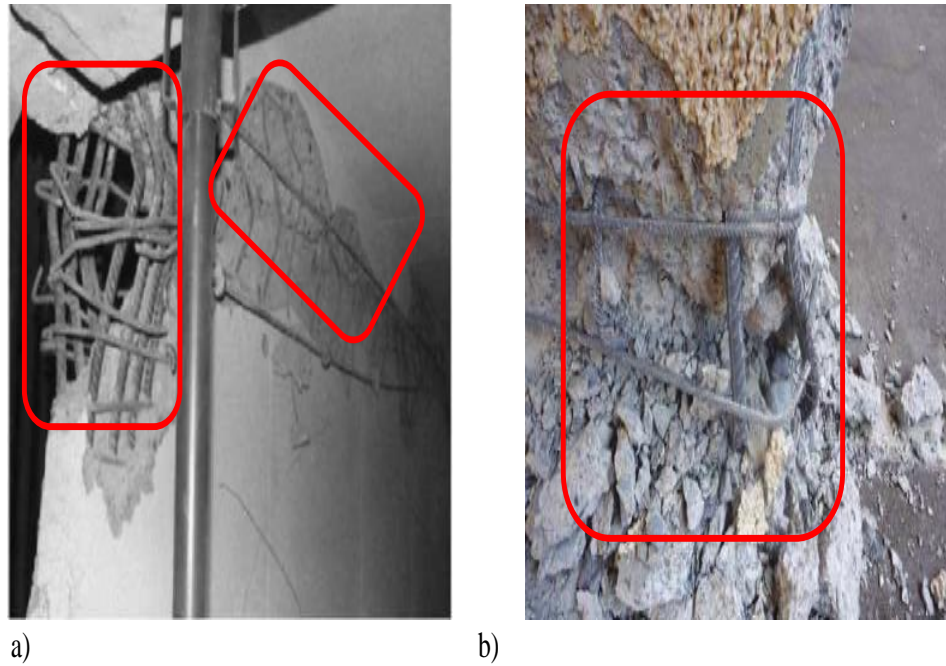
Thin shear wall failure, (a) flexural compression failure, and (b) buckling of vertical bar due to lack of boundary elements
